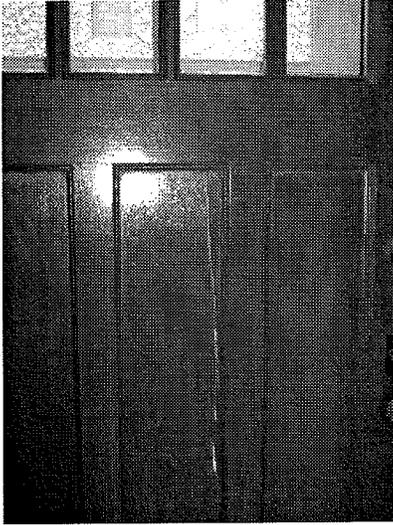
Example of Window/Wall Crack with A Lot of Air Leakage
